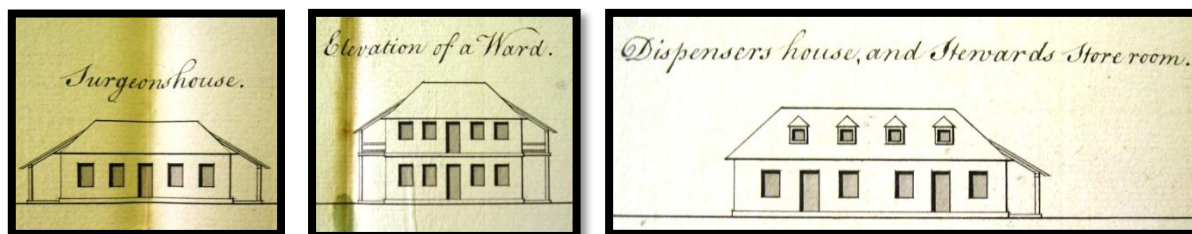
Proposed Ward, Surgeon’s House and Dispenser’s House, 1773⁷²
